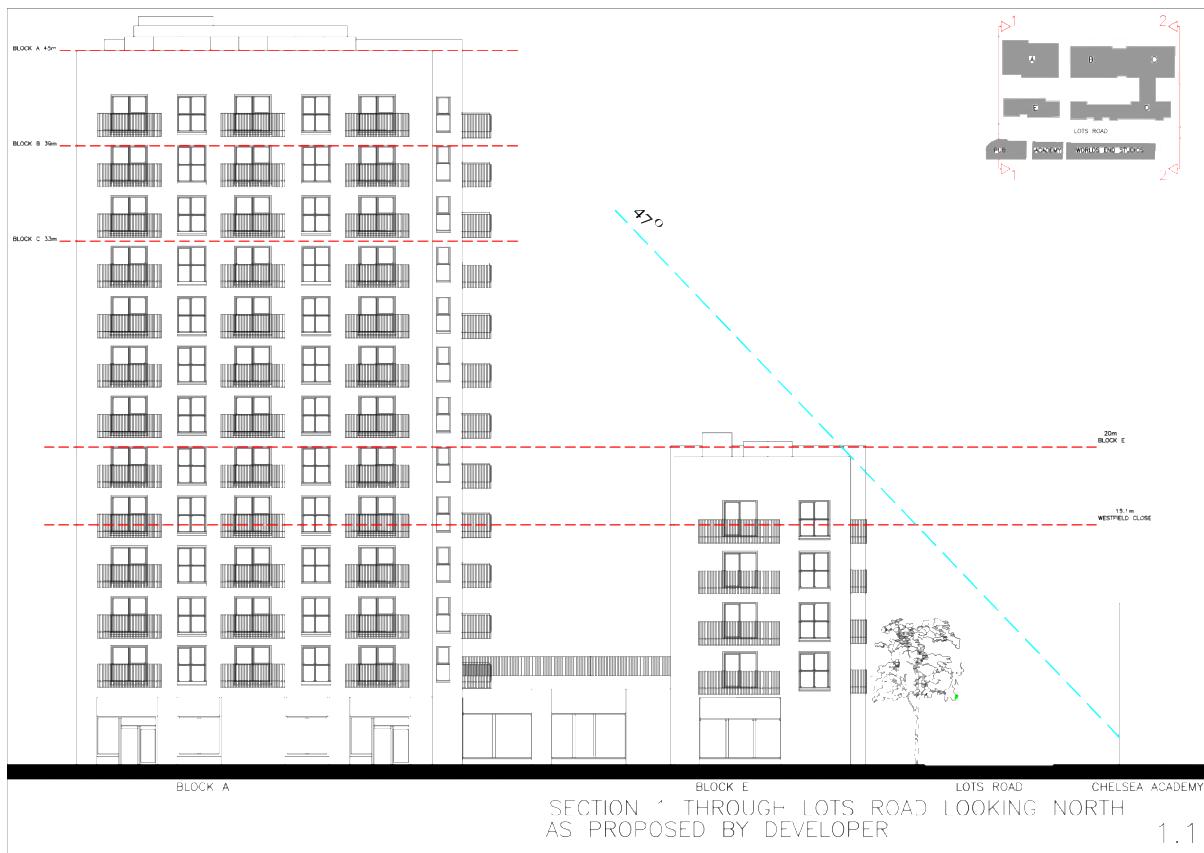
The negative impact of Mount Anvil's proposed building heights looking North
